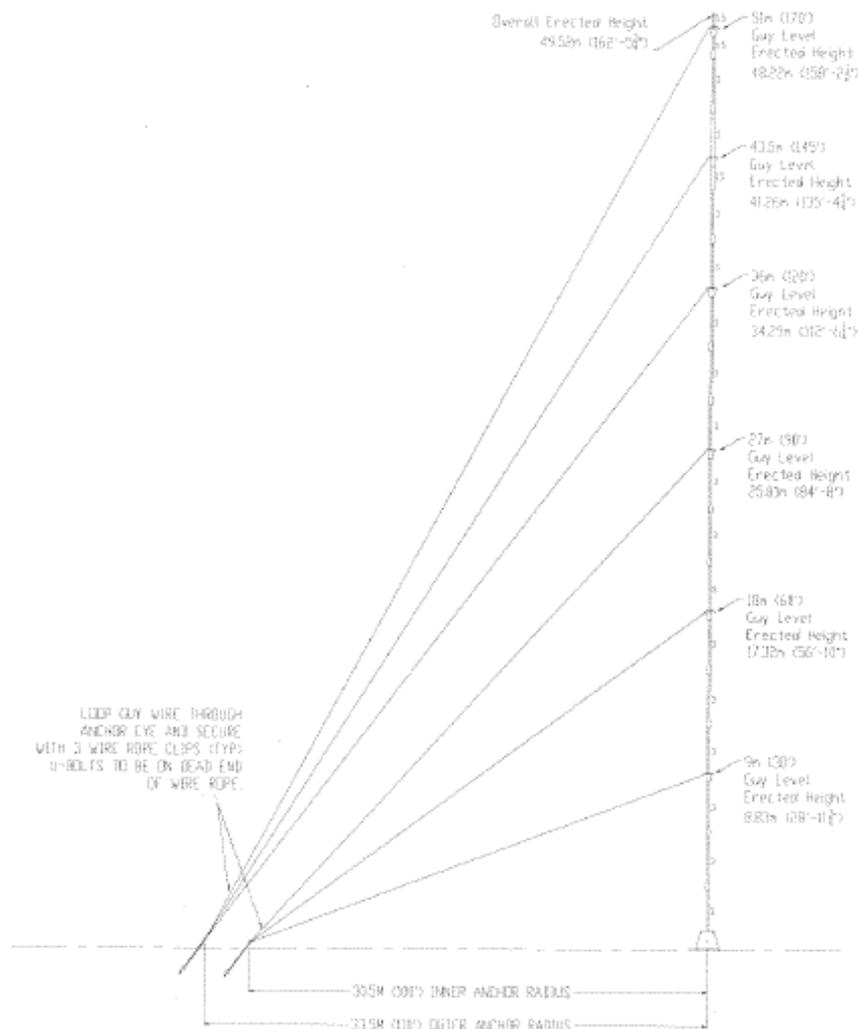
Drawing of a 50-m Tall Tower Assembly
